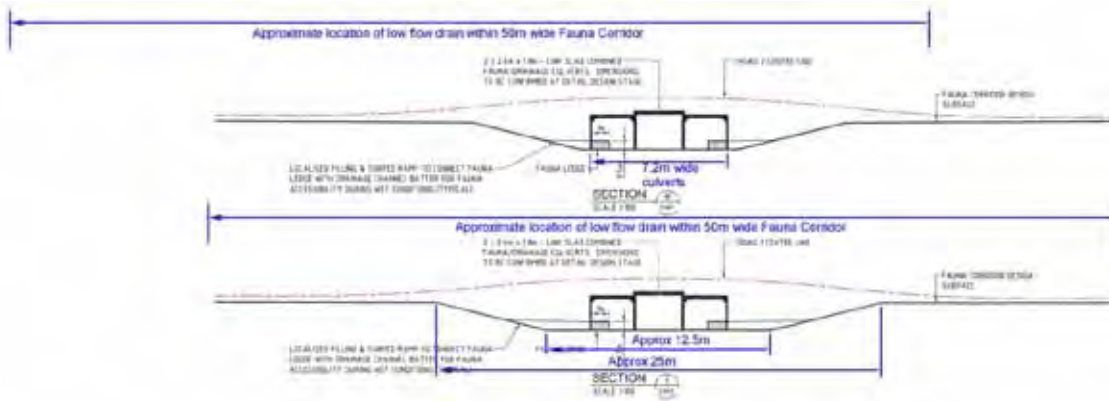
Applicant's fauna crossing plan submitted Jan 2014 (Part of Plan No YC0229-11E1-FC01 Revision E) with blue notation added for clarity by Council
